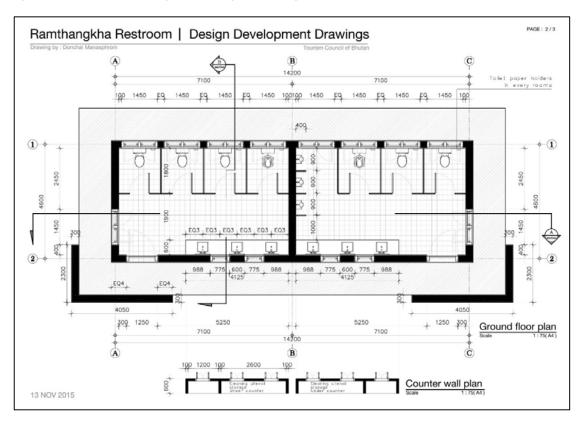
Renovation drawings of Ramthangkha (Taktsang base) restrooms
